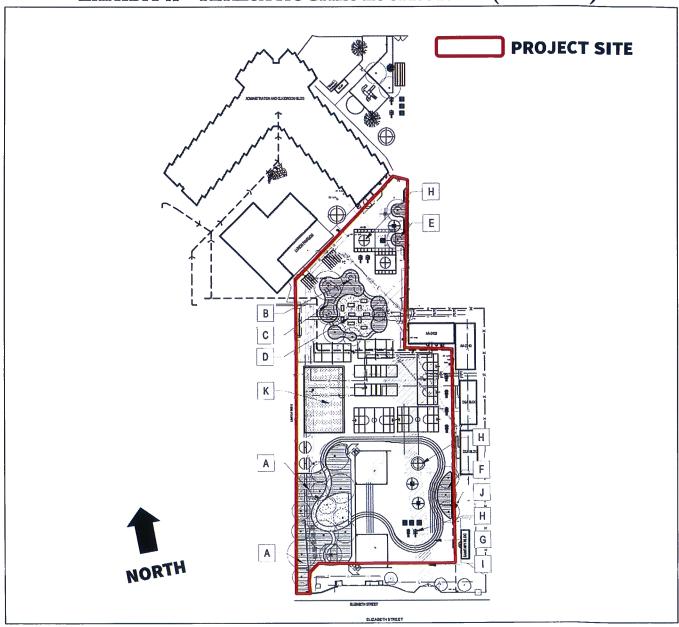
## EXHIBIT A - HOBART BOULEVARD ES SITE PLAN (not to scale)
